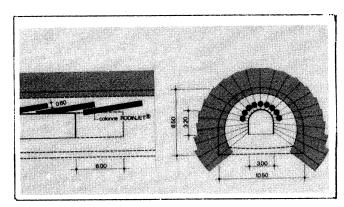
Principle of tunnel excavation by forming pilot (protected by horizontal jet grouting), to allow treatment (by permeation grouting) for full bore excavation. Milano Metro Line 3
